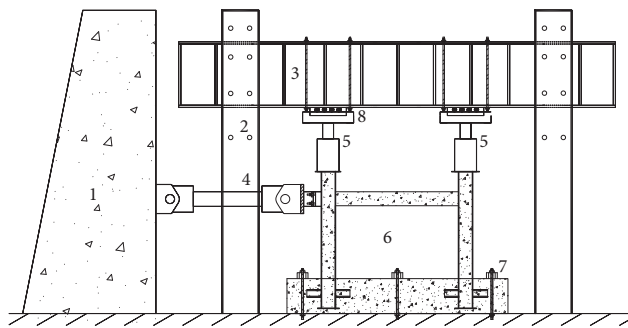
Loading device areas. 1: reaction wall of reinforced concrete; 2: steel column of vertical reaction; 3: reaction steel beam, connected with reaction steel column by high-strength bolt; 4: electrohydraulic servo actuator; 5: hydraulic jacks; 6: specimen; 7: pressure beam of steel structure; 8: roller device.
